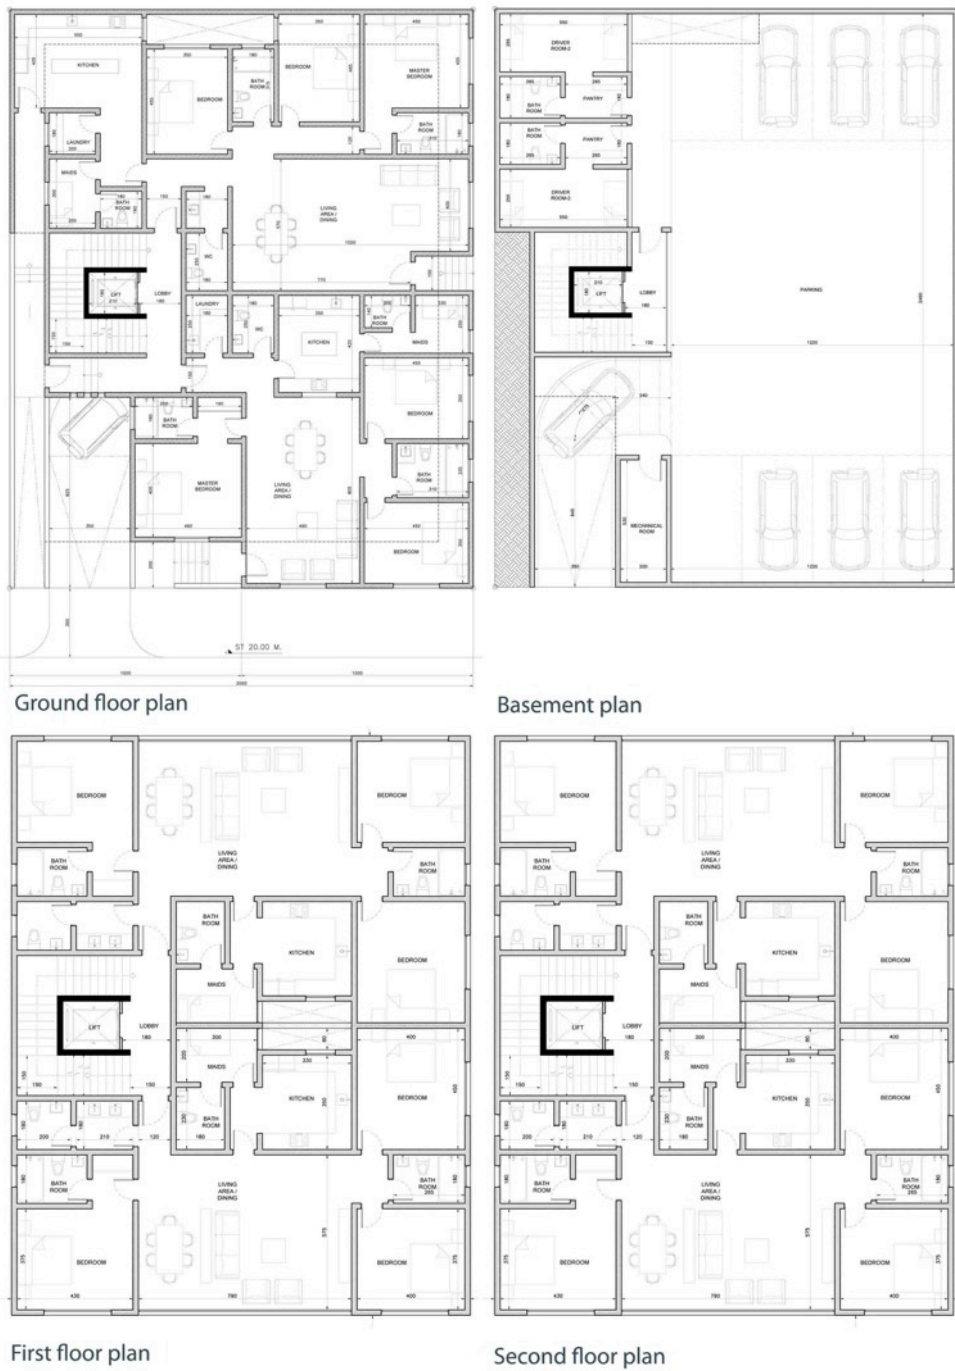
Typical apartment house floor plans. Source: Design office in Kuwait, 2018.
